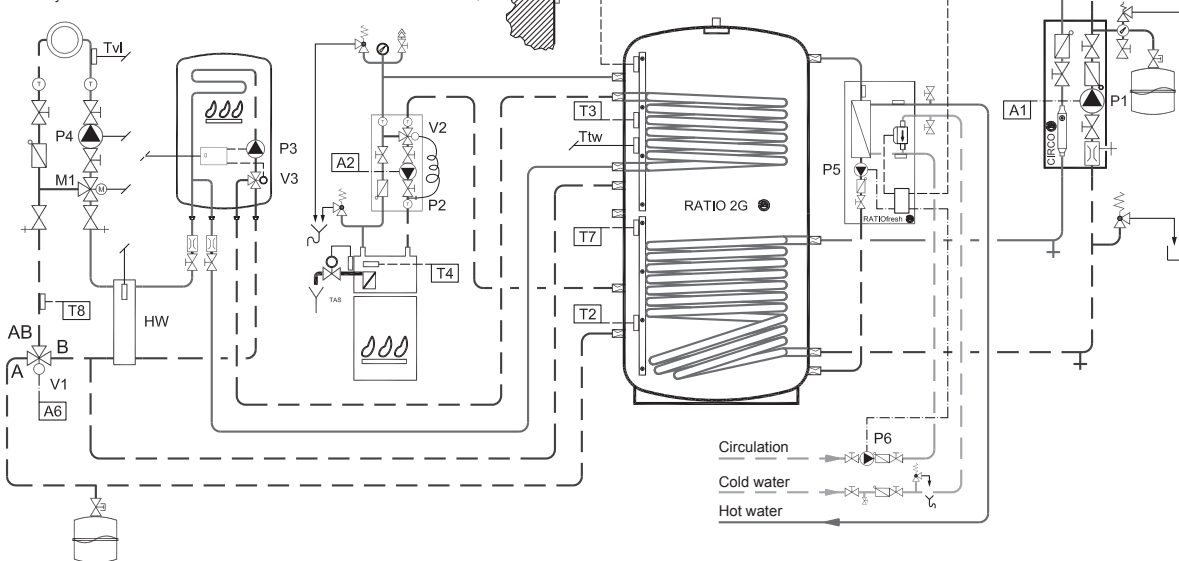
System solution with RATIOfresh 250/400, RATIO buffer storage, gas boiler, fire place with water pockets, mixed heating circuit and solar installation. Both, open fire place and solar installation, can load the buffer storage. The buffer storage heat is supplied to the heating circuit via return flow boost.
